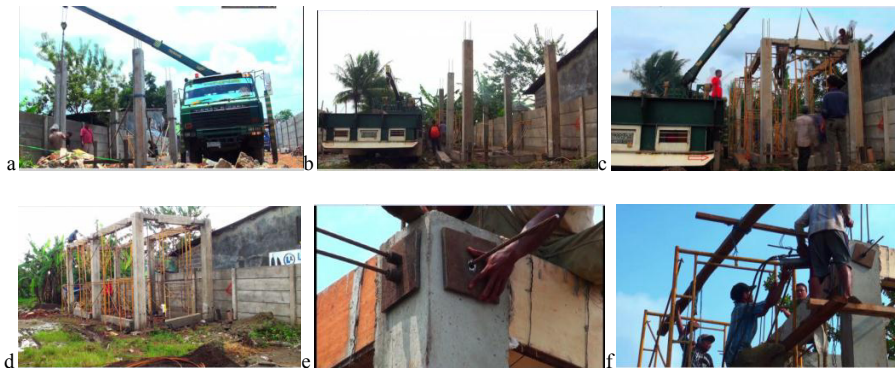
The documentation of first building using PRESSS,10(a) erection of column,10(b) grouting of column,10(c) erection of beam,10(d) grouting of beam,10(e) post tension unbonded installation,10(f) stressing
